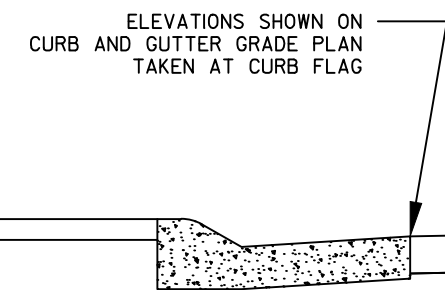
DETAIL FOR GUTTER CONSTRUCTION AT INLETS
